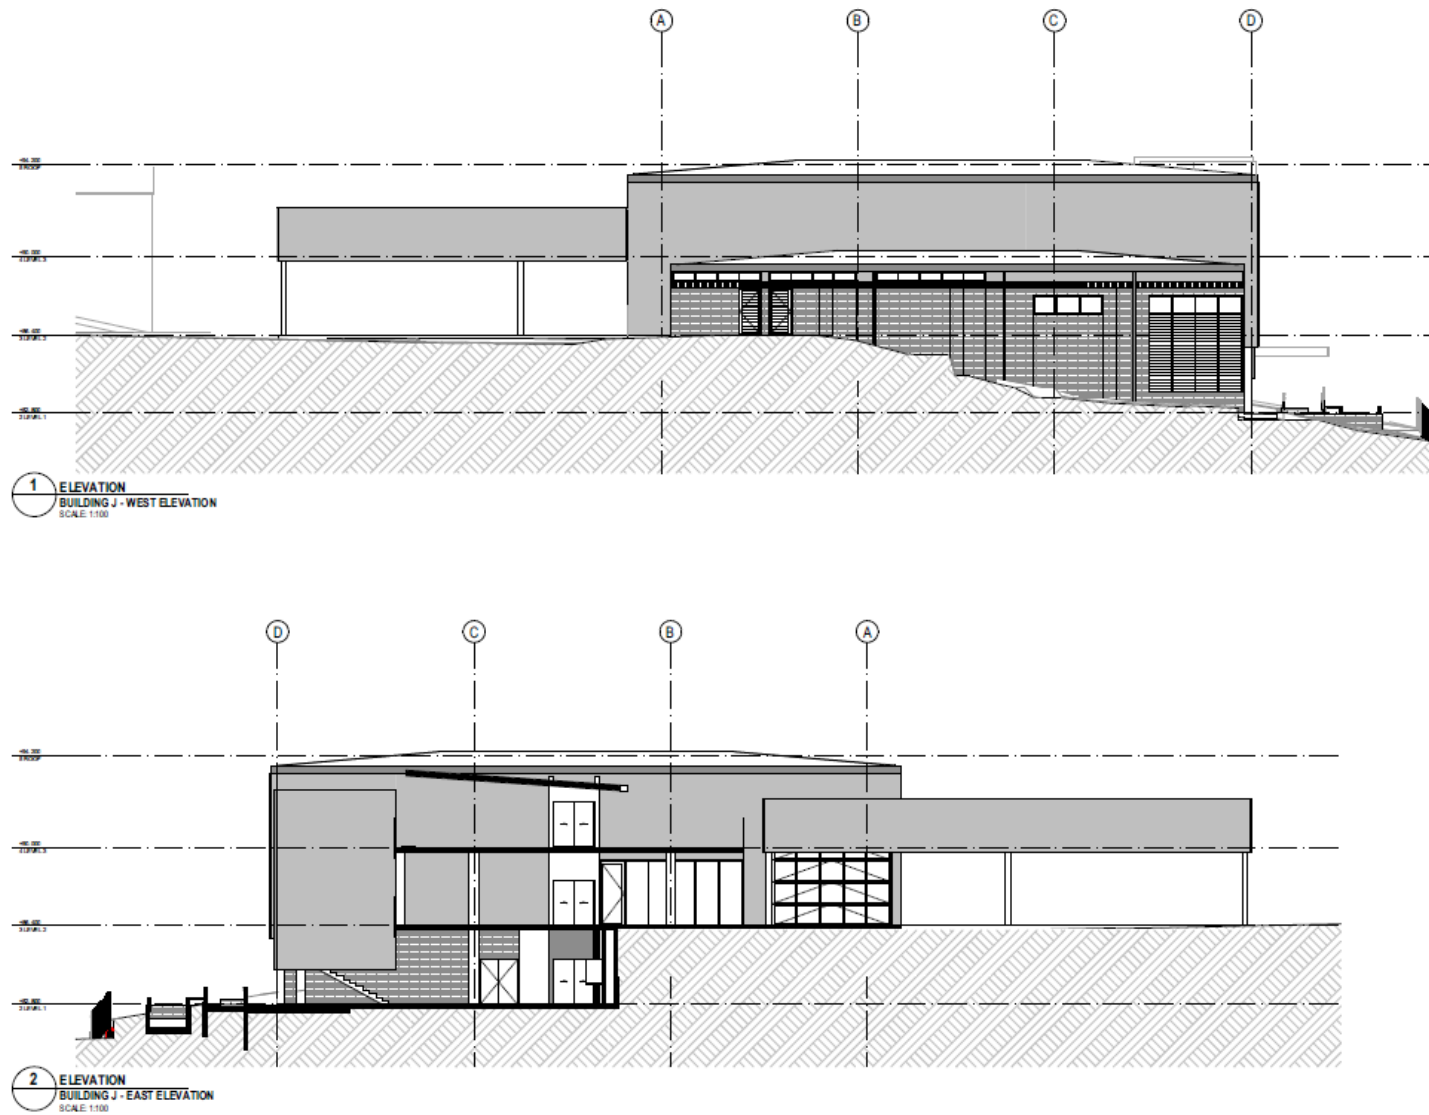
Proposed Building J West and East Elevations. Source: Fulton Trotter, 2021
